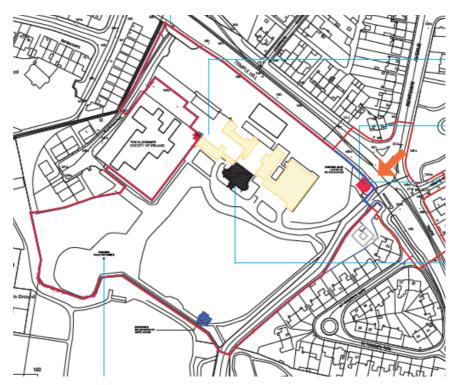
Existing (red) and proposed (blue) site plan of Gate Lodge
